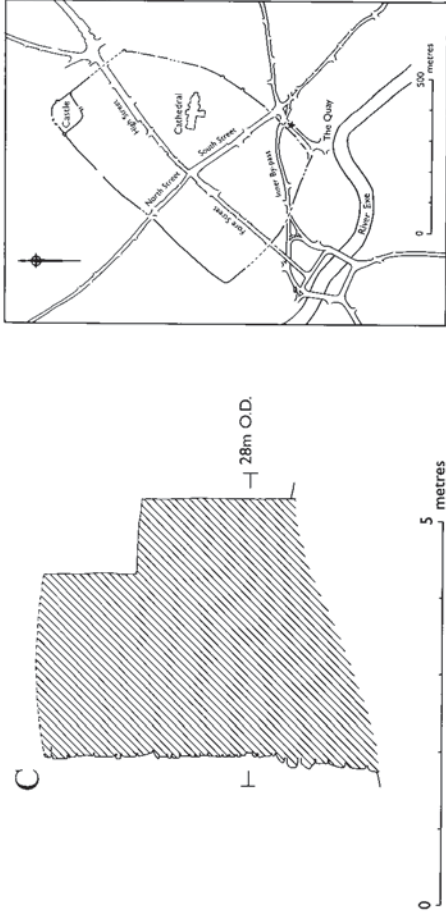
Western Way-Watgate external elevation, section. Scale 1:100.
